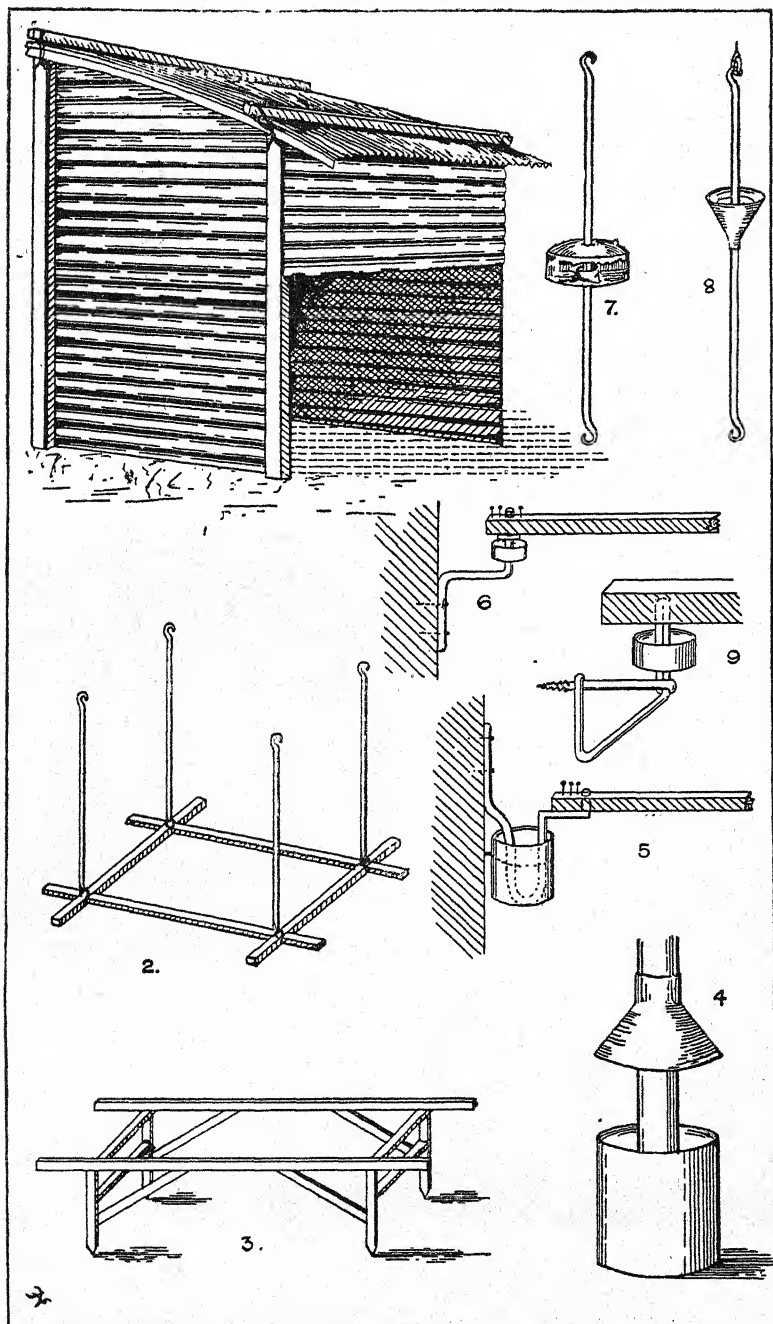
1. Tick-proof Fowl House with woodwork outside. 2. One level roost to show how supported by rods or wires. 3. One level roost supported from floor. 4. Suggestion for insulating leg of No. 3. 5 and 6. Methods of insulating roosts by tick-proof wall brackets. 7 and 8. Insulation devices for rods and wires; in 7 which is dust-proof (figured with part of side cut away to show oil furrow) the oil is poured in through the aperture at the top. 9. Tick-proof roost bracket procurable from dealers in poultry supplies. (After Lounsbury.)
